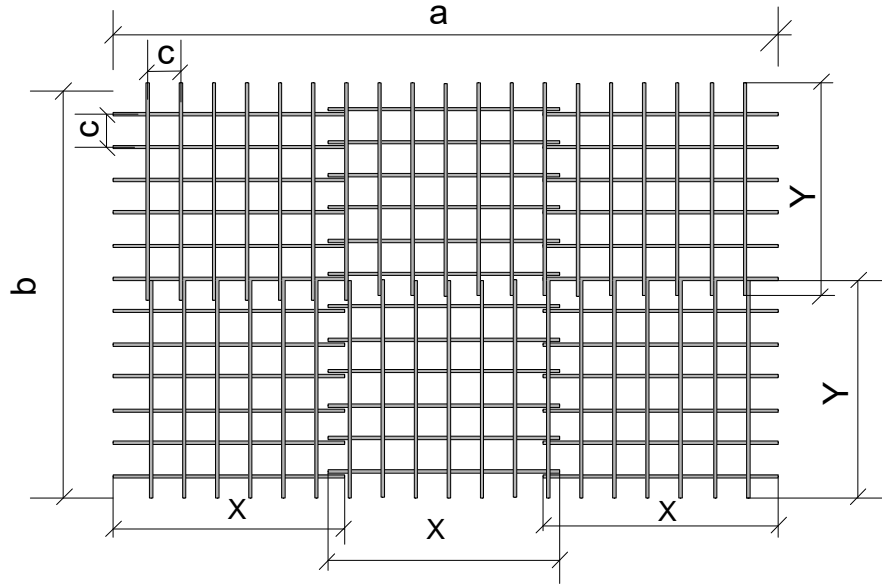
Rebar Layout Arrangement Plan Sample ($n_x = 3, n_y = 2$)
